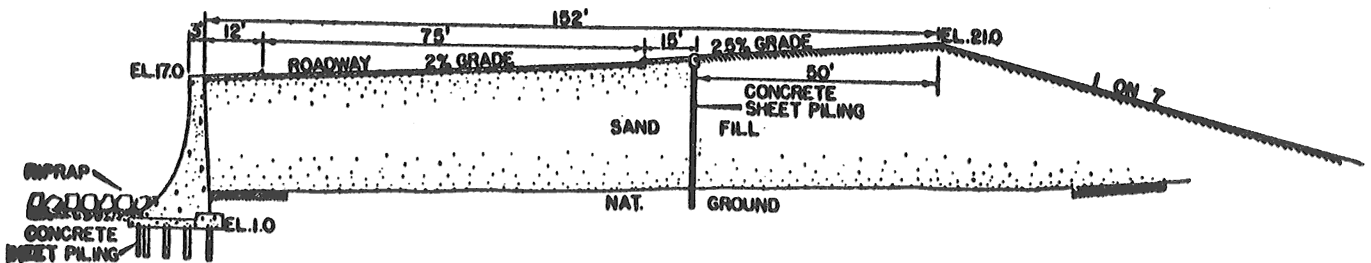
f. 1953-63—Three-mile west extension of seawall.
